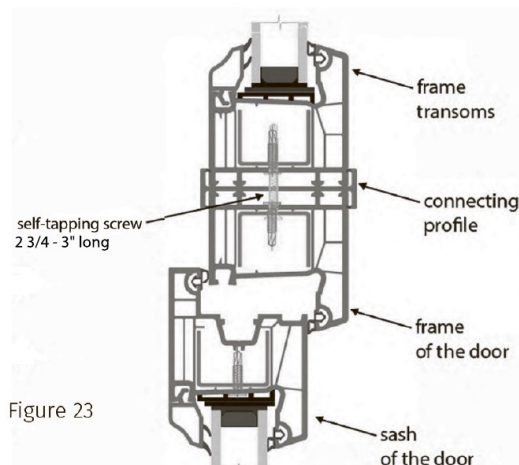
H-shape connecting profile joining the door frame to the transom sash.
